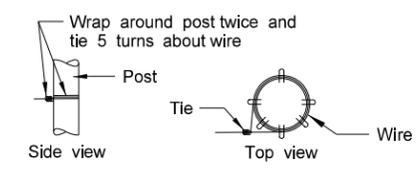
DETAIL FOR TYING FENCE TO WINGS OF ABUTMENTS
